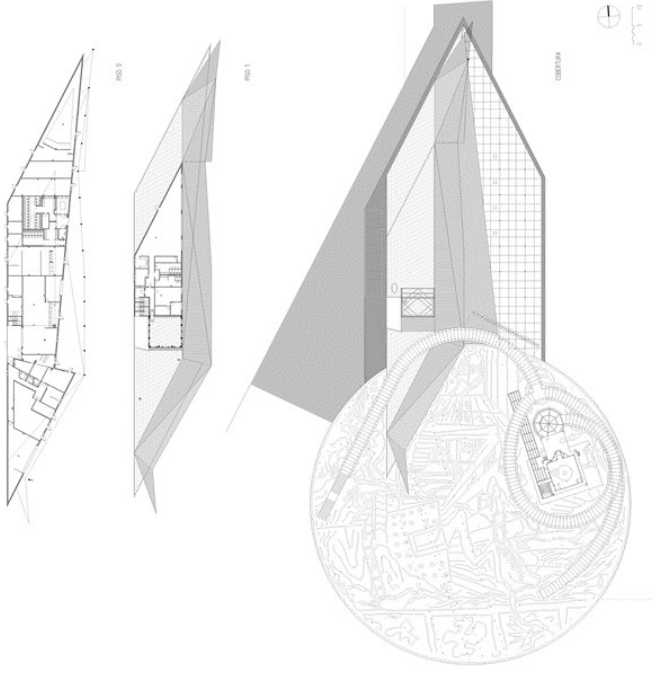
The south door of Expo '98, architectural plans by architects Manuel Graça Dias and Egas José Vieira (Graça Dias + Egas Vieira, 1994-1998)
